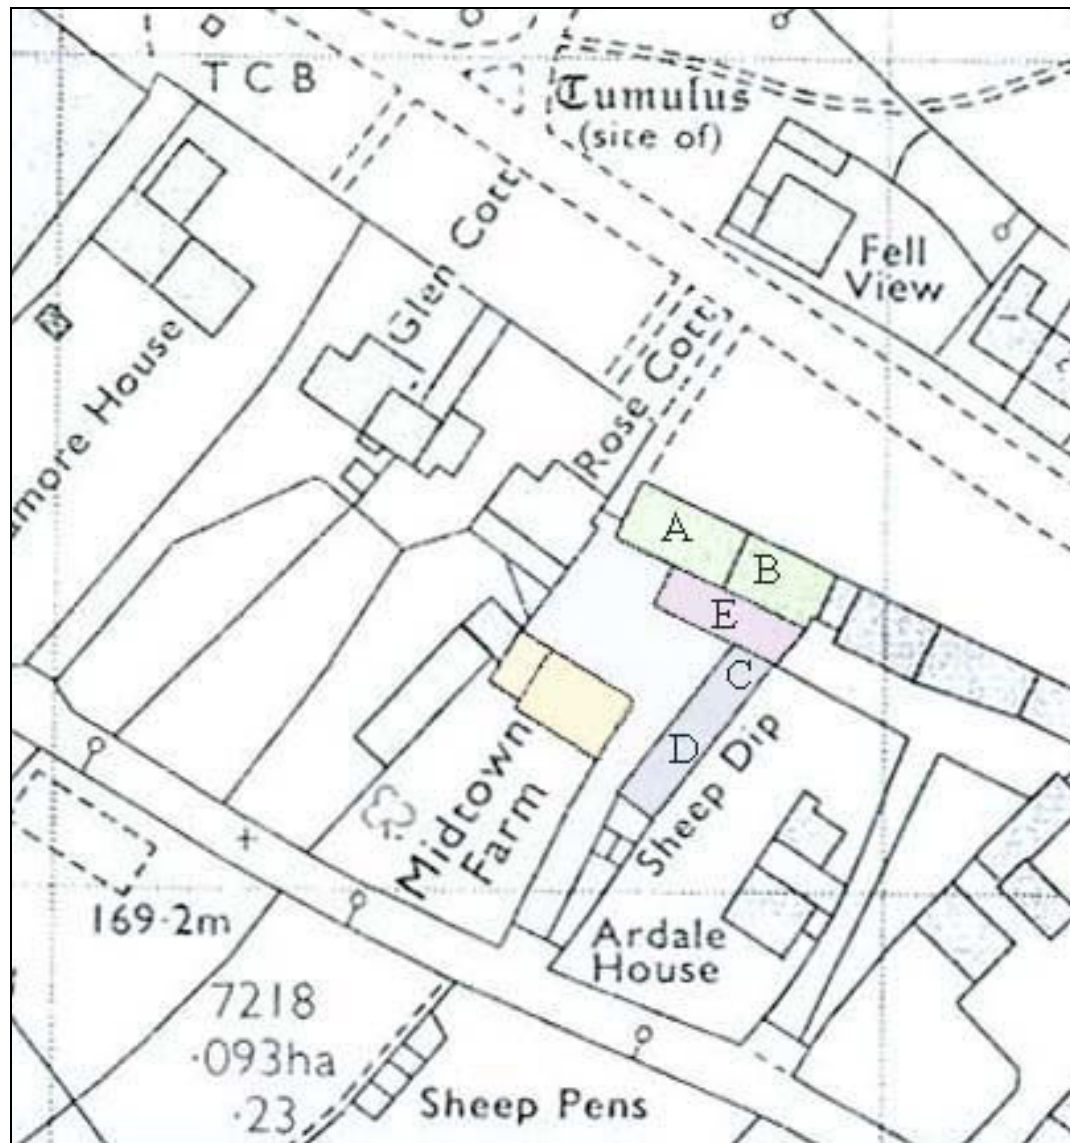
Site plan (Source = OS Map 1971, Scale 1:2500). Buildings A and B are coloured green, House is yellow, Buildings C and D are blue and Building E is pink
